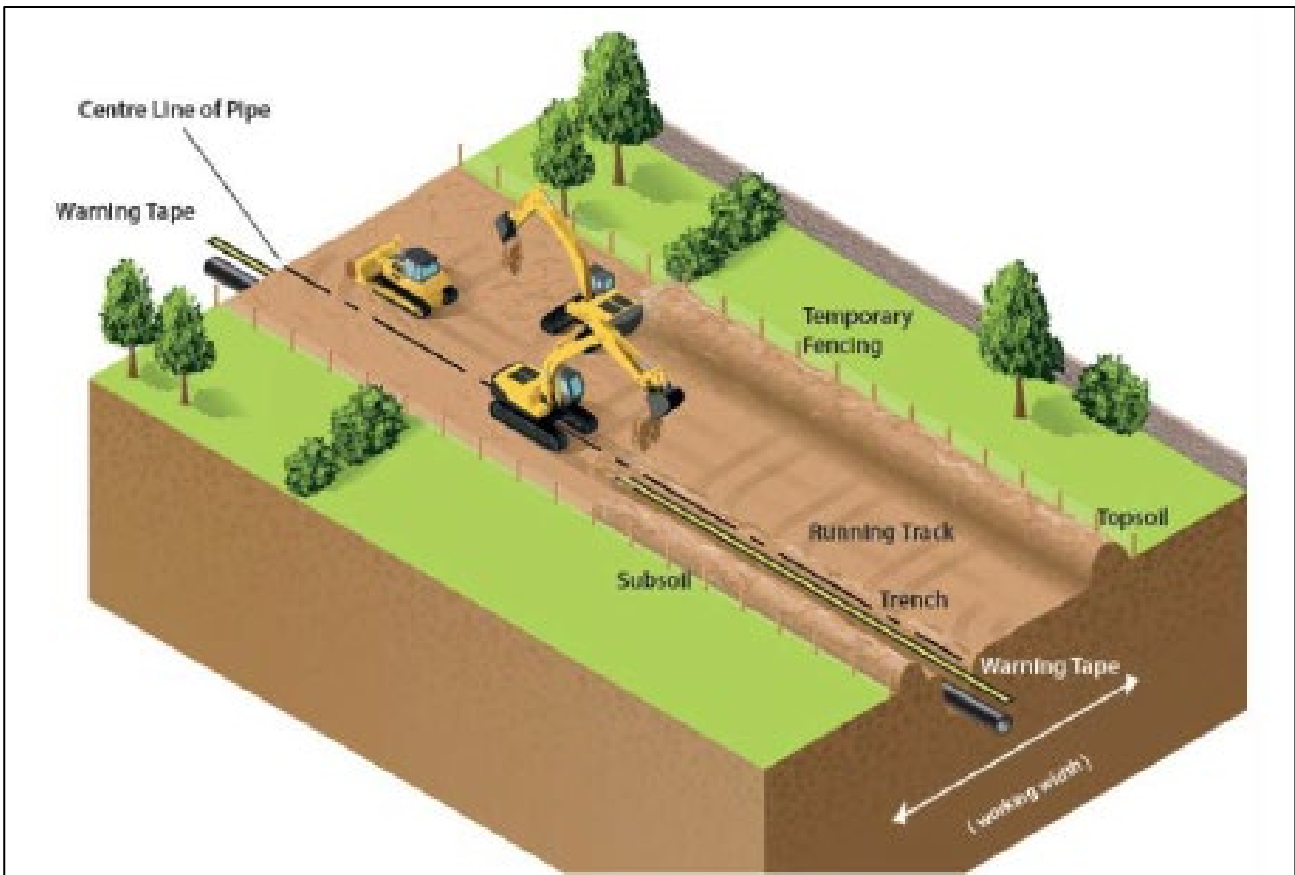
Typical pipeline installation working arrangement across agricultural lands
